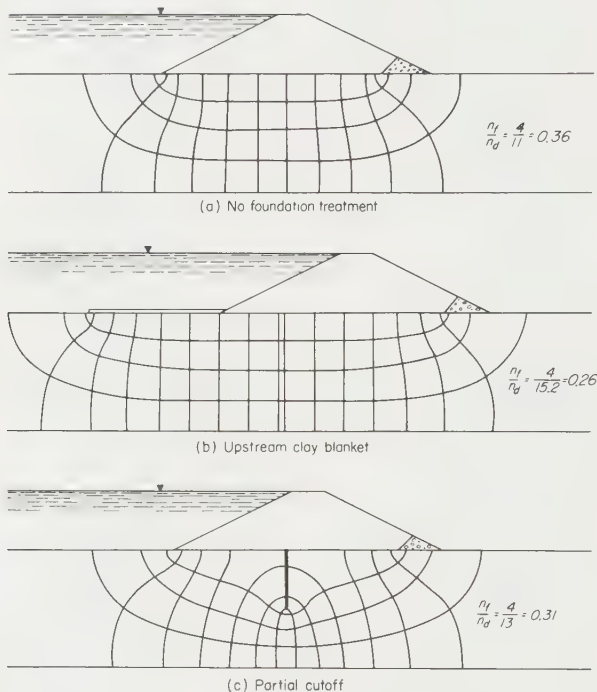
Effect of foundation treatments on flow through pervious foundation.
